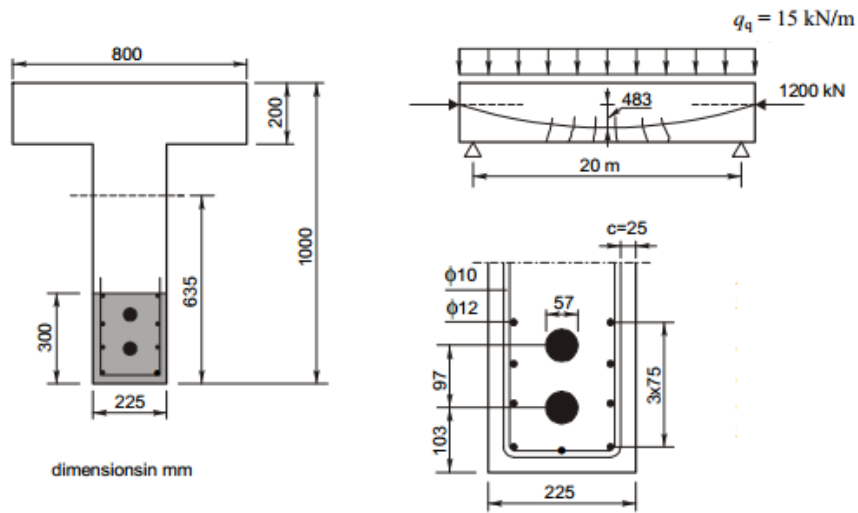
Crack control with prestressed beam [CIE4160]
